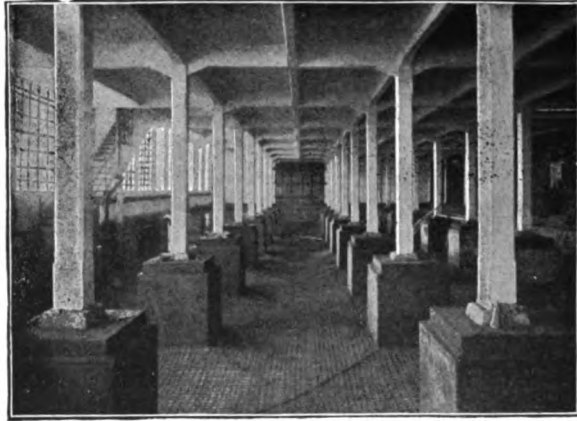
Woven wire reinforcement for a water-tight cellar in reconstruction of the Daimler motor factory in Unterturkheim.
